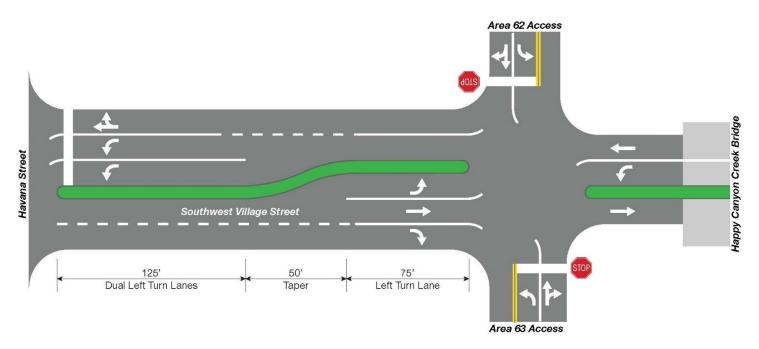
Southwest Village Street Auxiliary Lane Recommendations
